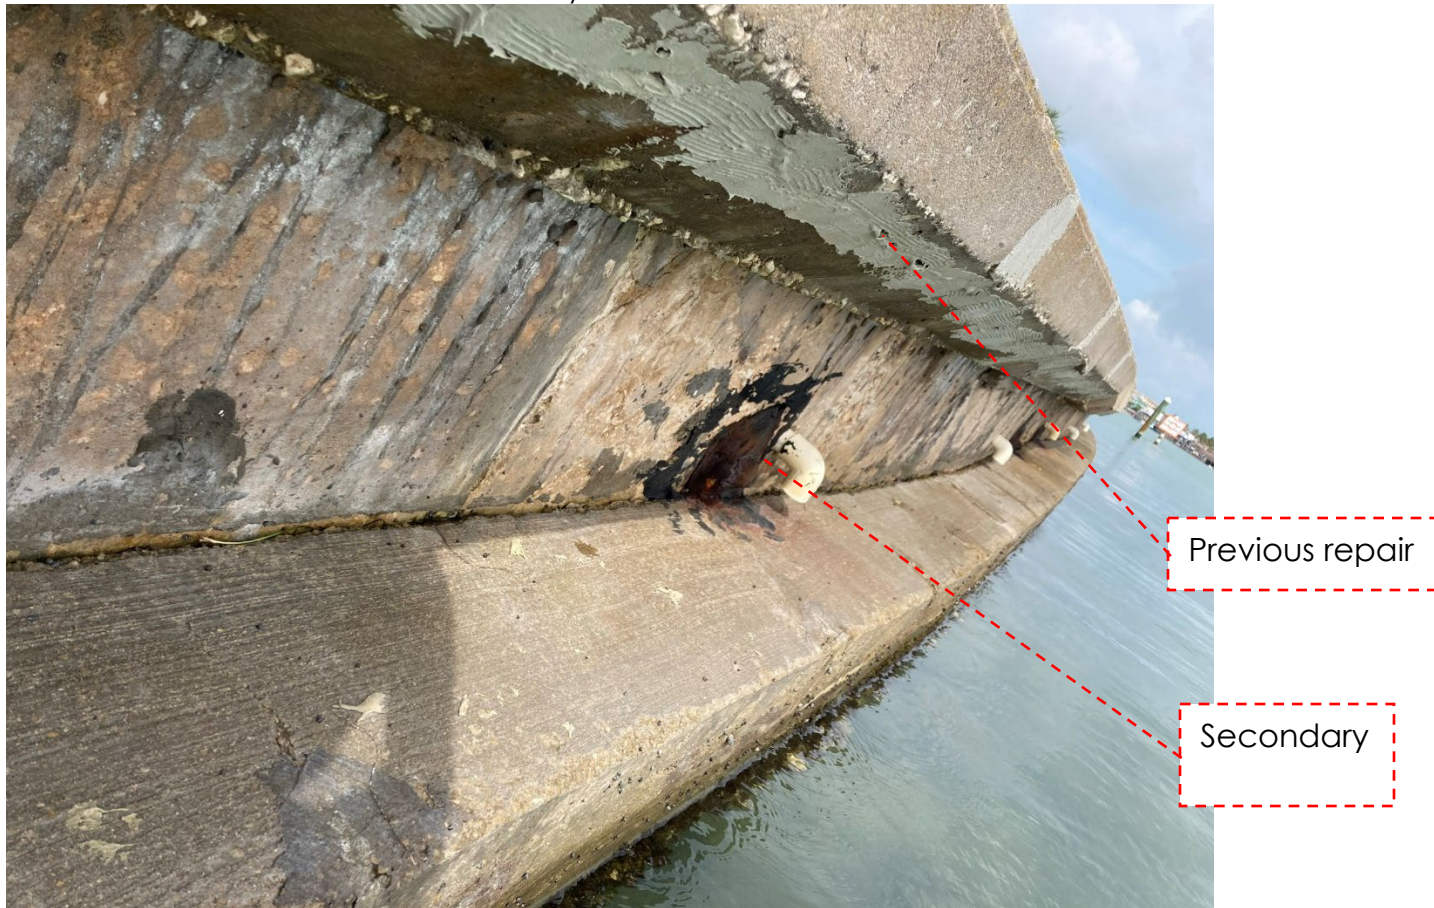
View of Corroded Secondary Anchor Washers and Nuts.
